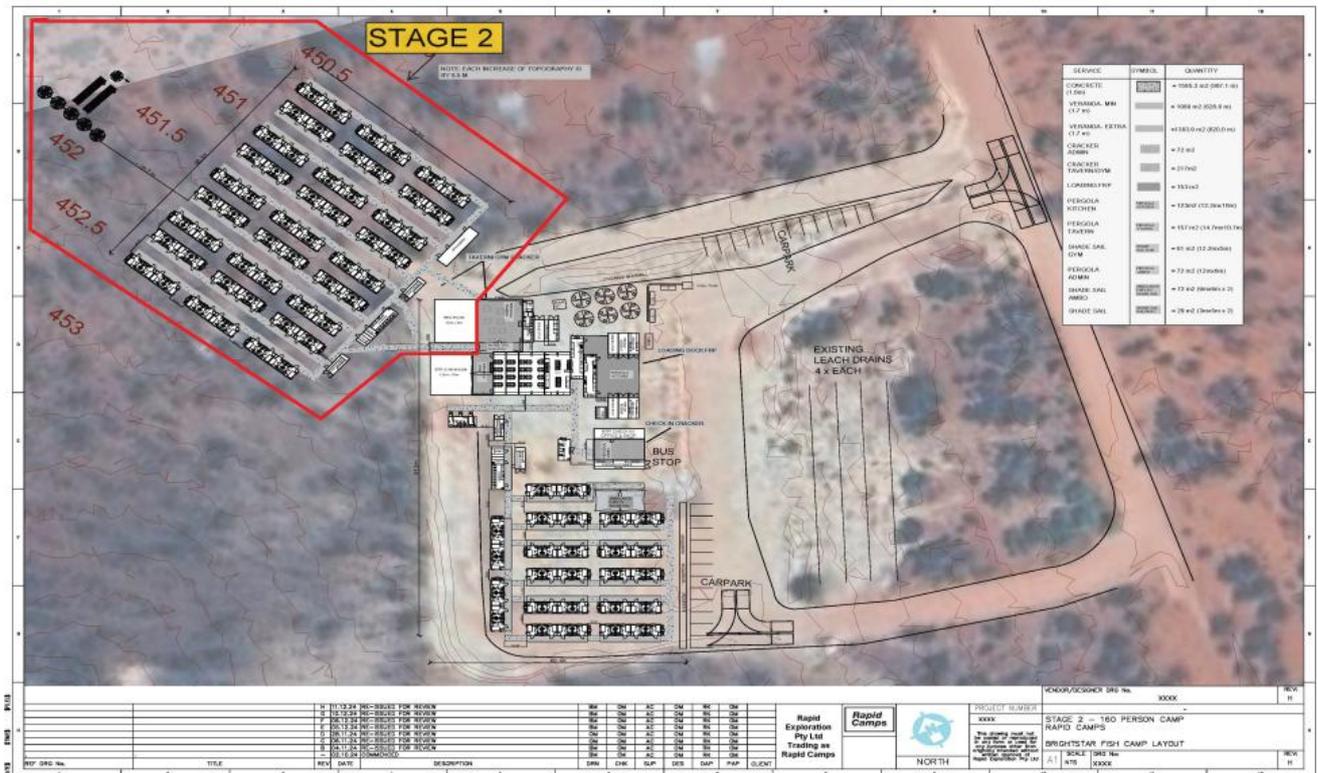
Indicative Stage 2 expansion plans at Jasper Hills camp (increase to 160 rooms)
